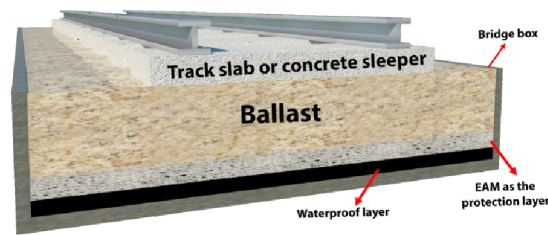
Schematic illustration of a typical cross-section of railway pavement structure on the bridge deck.
